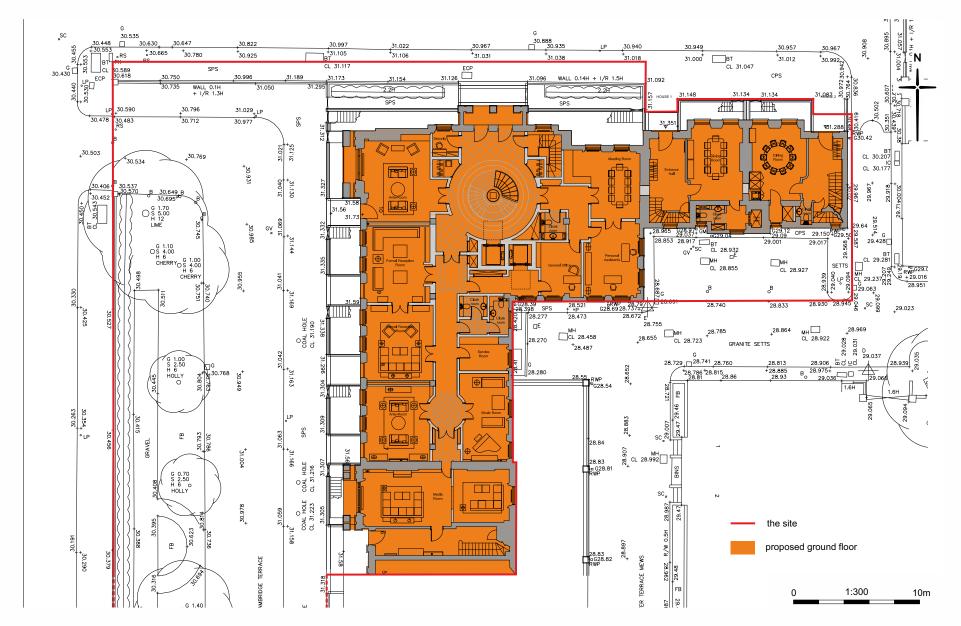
Proposed ground floor (Moxley Architects Ltd drwg 639-2.003 dated November 2008)
